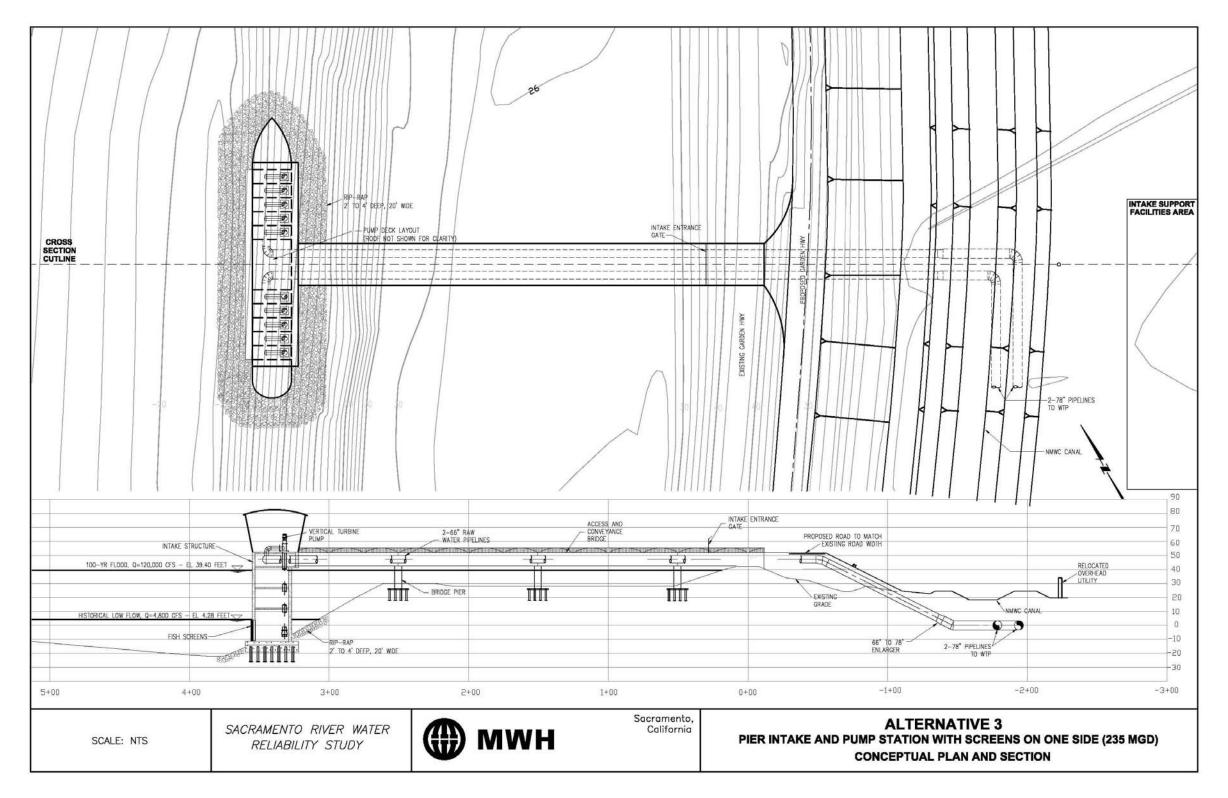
Alternative 3 - Pier Intake Structure and Pump Station with Vertical Screens on One Side
